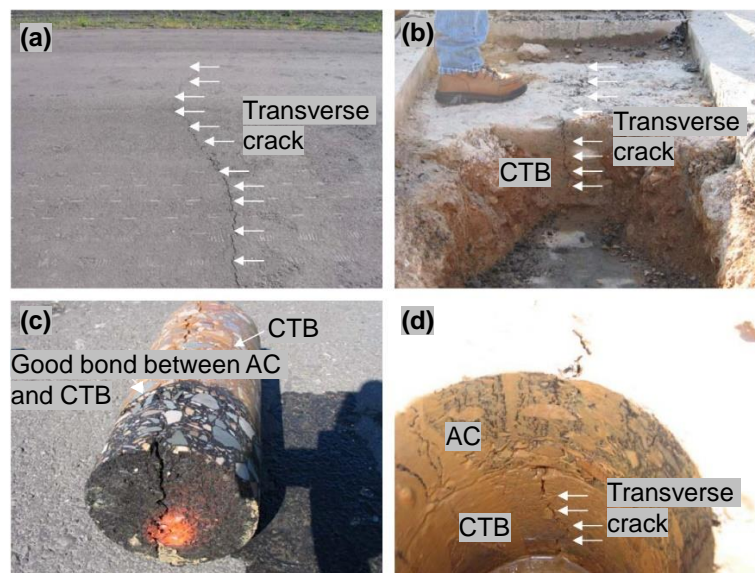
Transverse crack of a typical pavement: (a) surface view, (b) pit showing failed CTB, (c) core from the cracked pavement, and (d) cored-profile of in-situ pavement [172].
